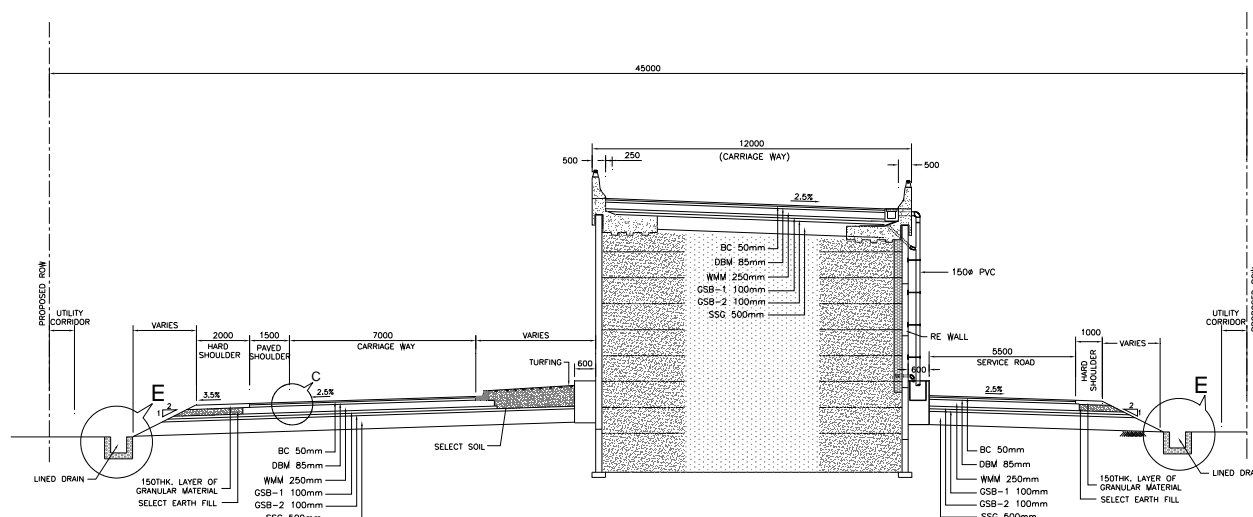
TYPICAL CROSS SECTION FOR UNIDIRECTIONAL FLYOVER APPROACH WITH SLIP ROAD AT 143.970 CH
